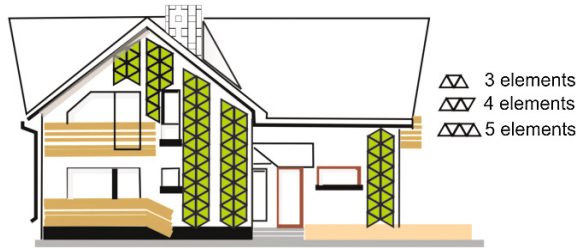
Vertically disposed array units with triangular elements on the façade of a residential house
